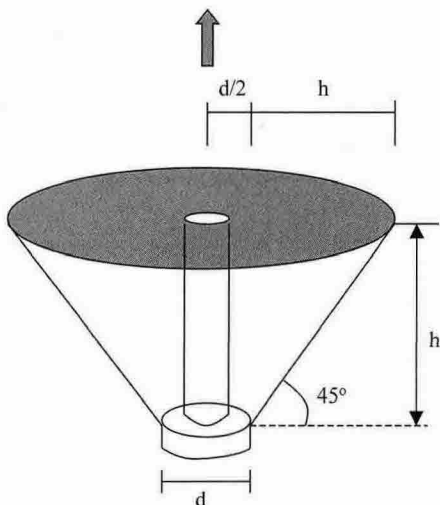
Failure mechanism of a cast-in-situ anchor bolt
